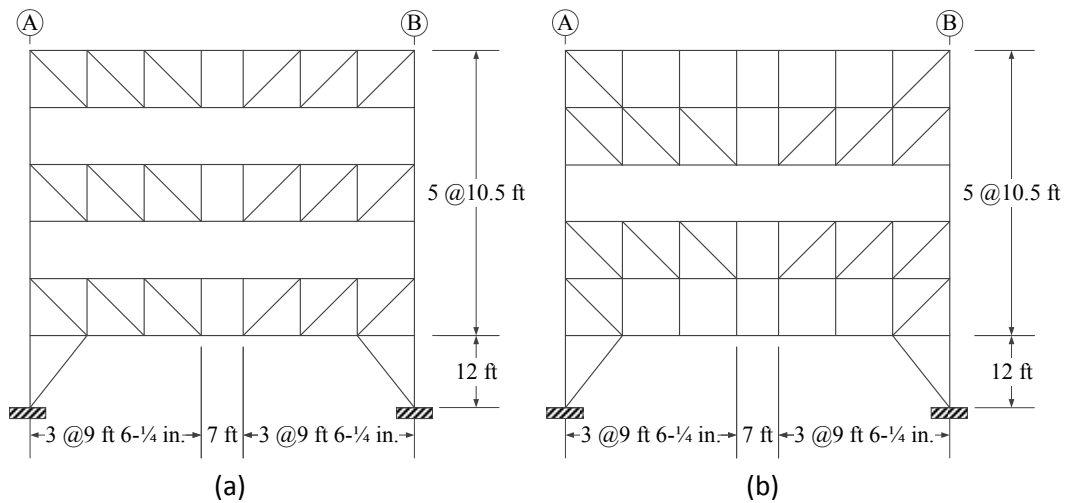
Structural geometry of the conventional 6-story STF system: (a) elevation view of odd bay; (b) elevation view of even bay.
